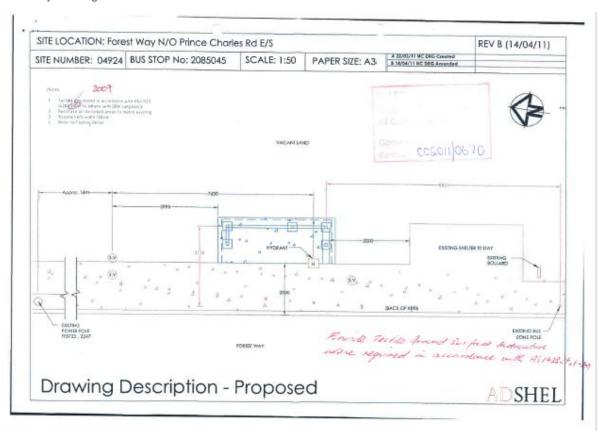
Shelter G2 CC2011/0670 Stamped Site Plan
